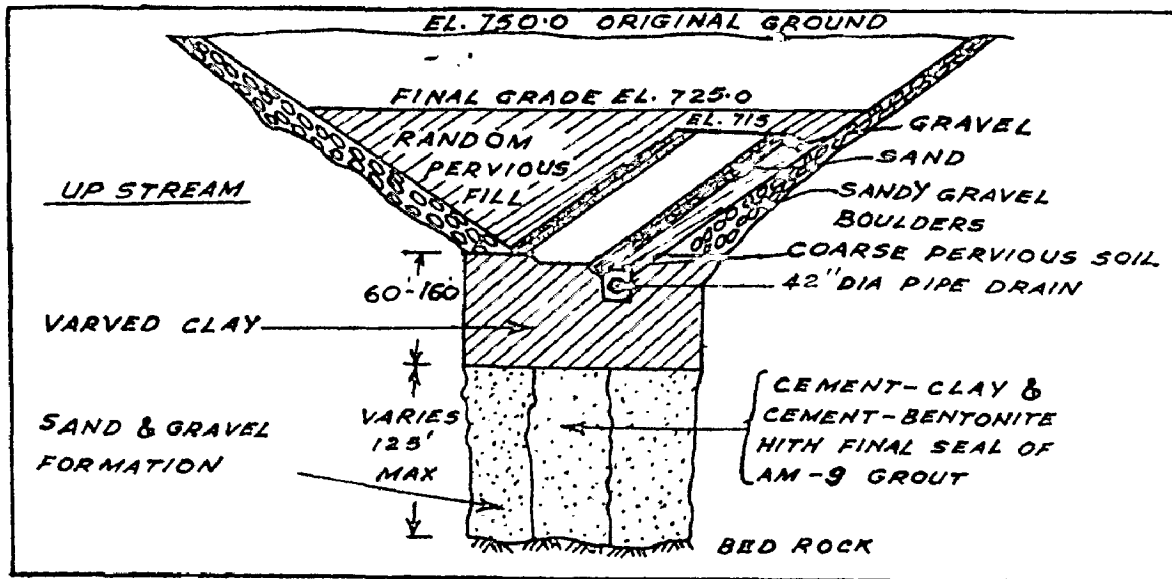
SHOWING SECTION OF CUT OFF WALL AT ROCKY REACH DAM.
